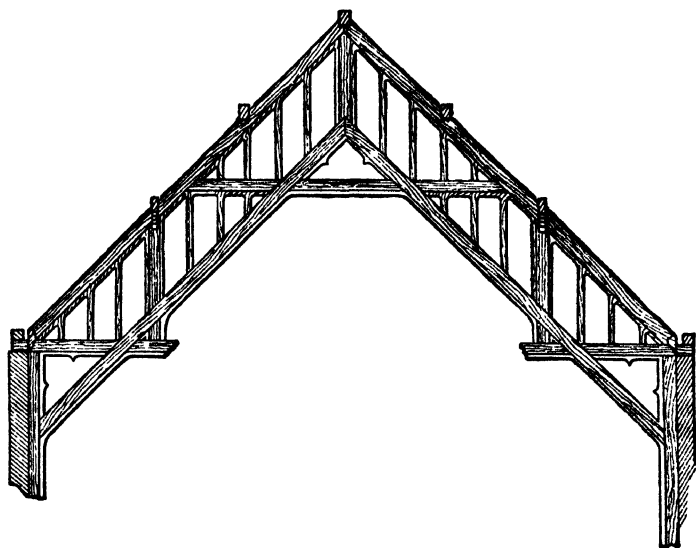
Truss for Emmanuel Church, Shelburne Falls, Mass.
